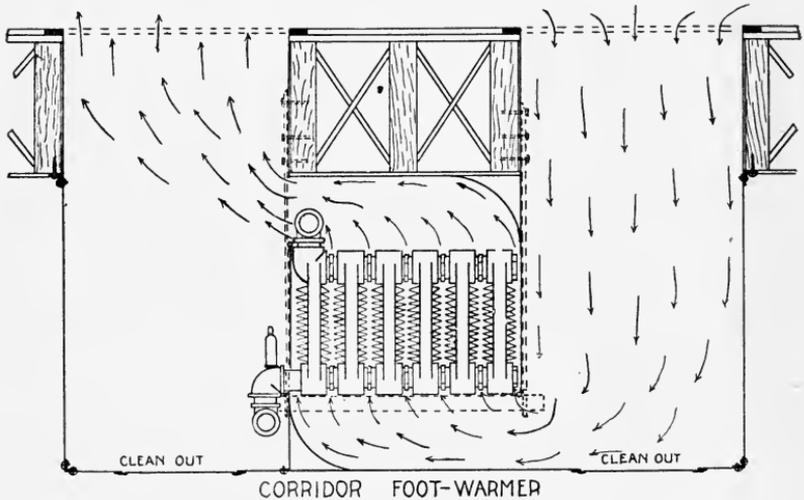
Plate XL.—Foot-warmers to be placed in schoolhouse corridors.
